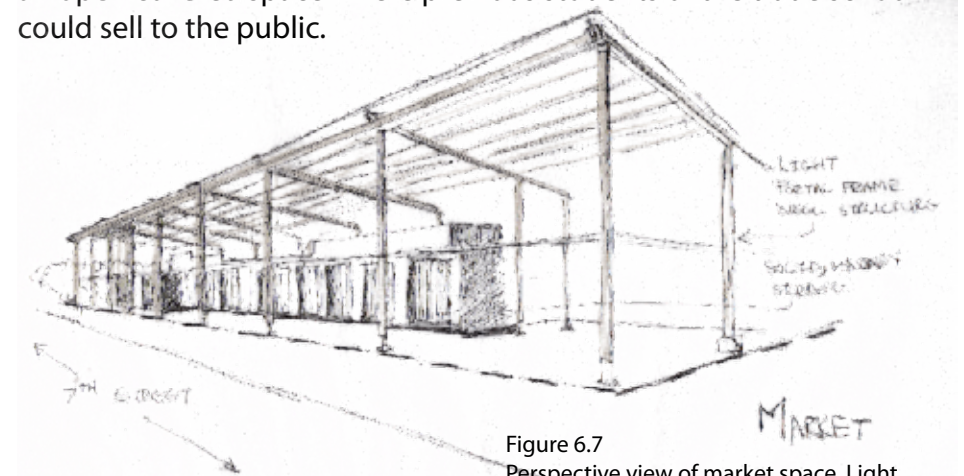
Perspective view of market space. Light portal frame roof structure with storage and trading space underneath. (Author, 2010).
